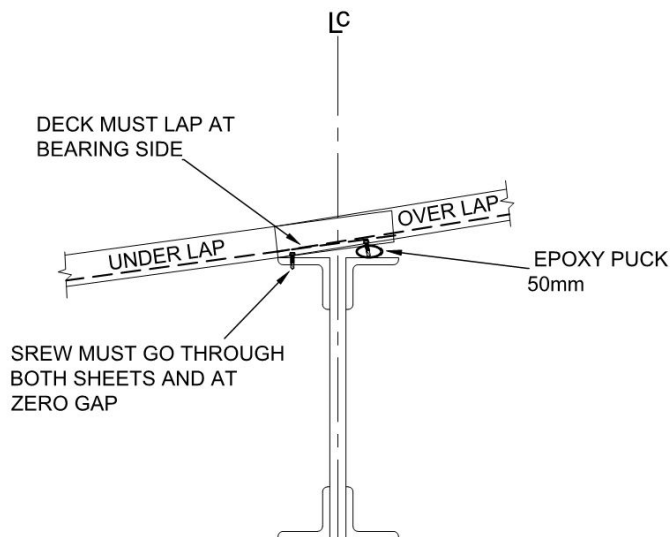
Epoxy bearing product detail, Excerpt from CANAM Erection Drawing DE100A
